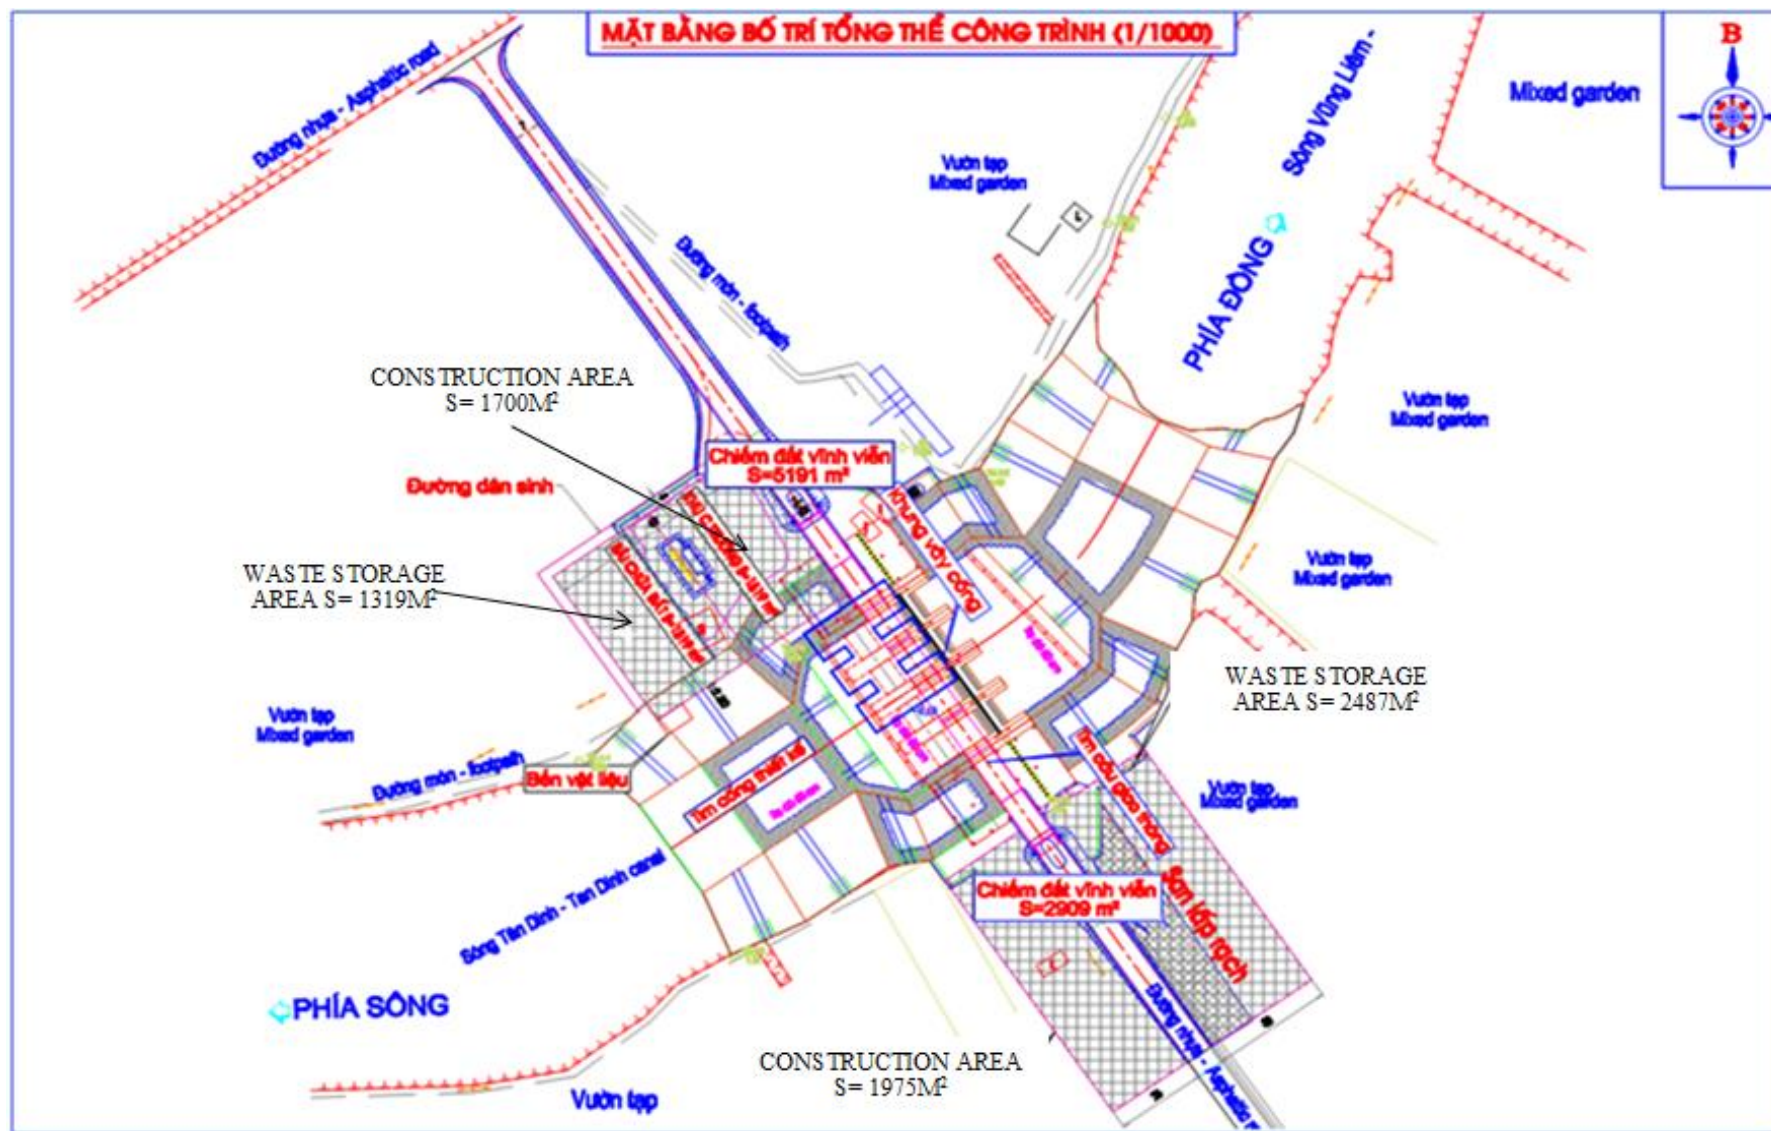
Locations for waste soil storage and disposal during construction of Tan Dinh sluice gate
